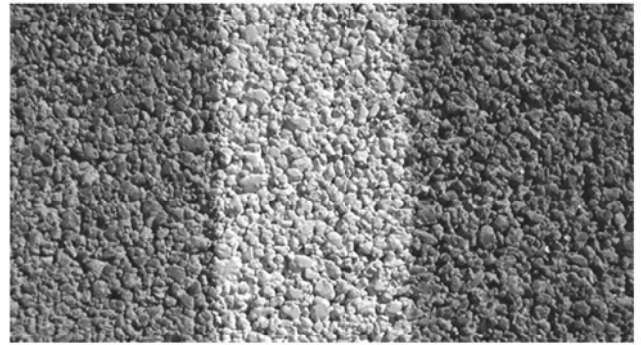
Painted lines visible on pervious concrete pavements.
